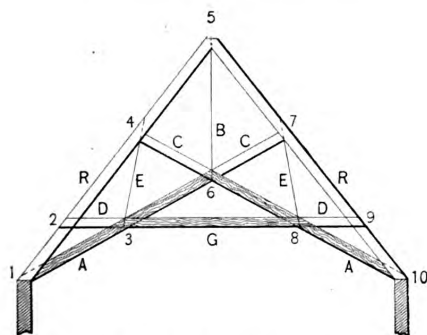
Form of Truss when Level Ceiling at Center is Wanted.
